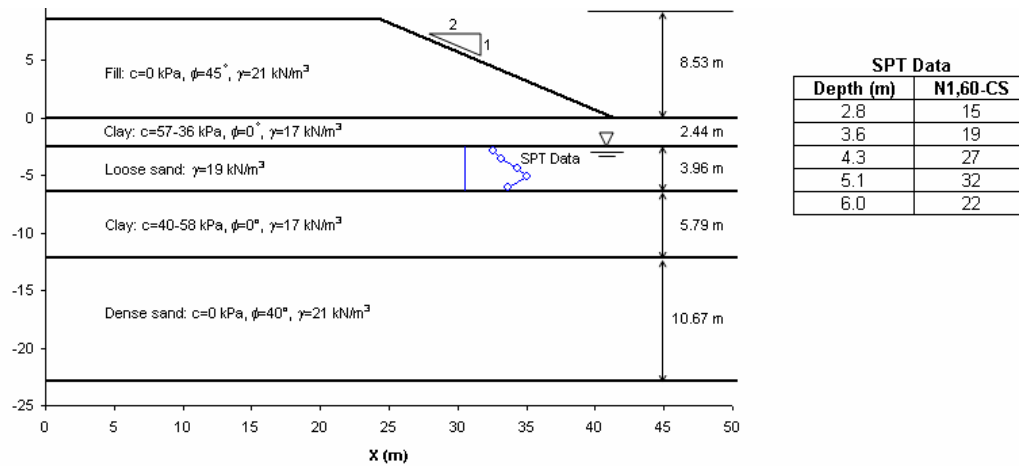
Left abutment – soil profile and dimensions (not to scale)
